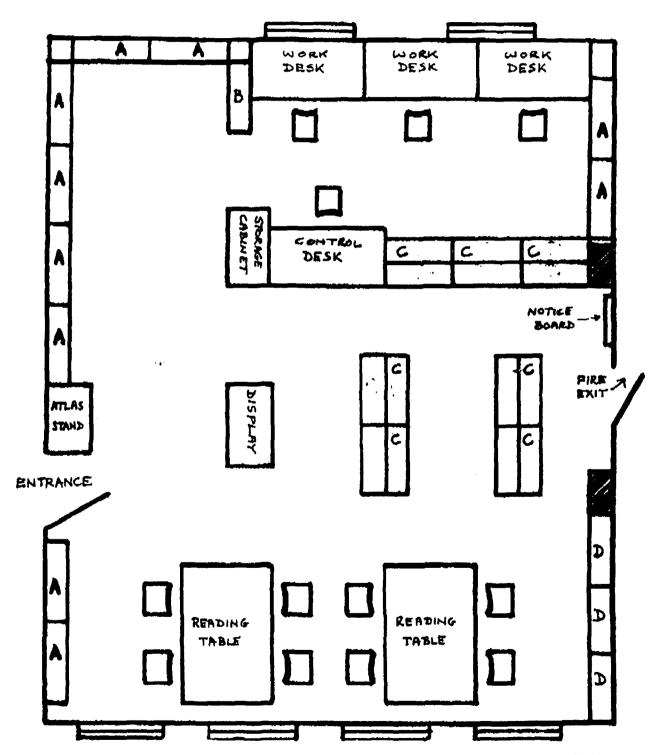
Temporary layout of existing library room only (see Appendix B.2 for key to furniture types)
